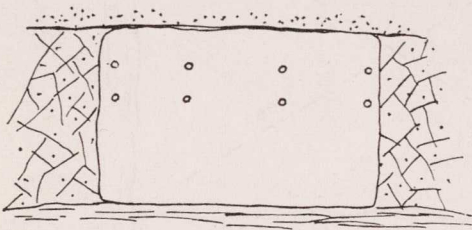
Plan of Shaft following the Ore body showing position of Cut Holes.
